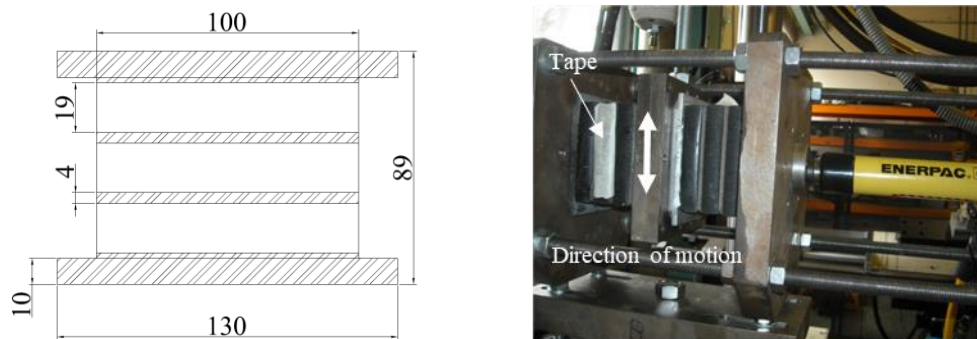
(a) Bearing geometry, (b) Double shear test set-up: two identical bearings mounted in the test jig, the external plates are fixed after the application of compression load and the central plate is free to move along the direction perpendicular to the compression load.
